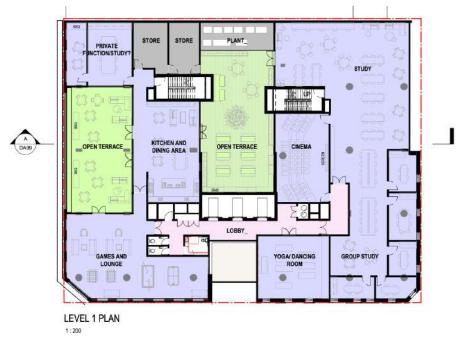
Extract from Brown Falconer drawings showing first floor (again noting the 'active' and 'public' uses behind the retained façade).
